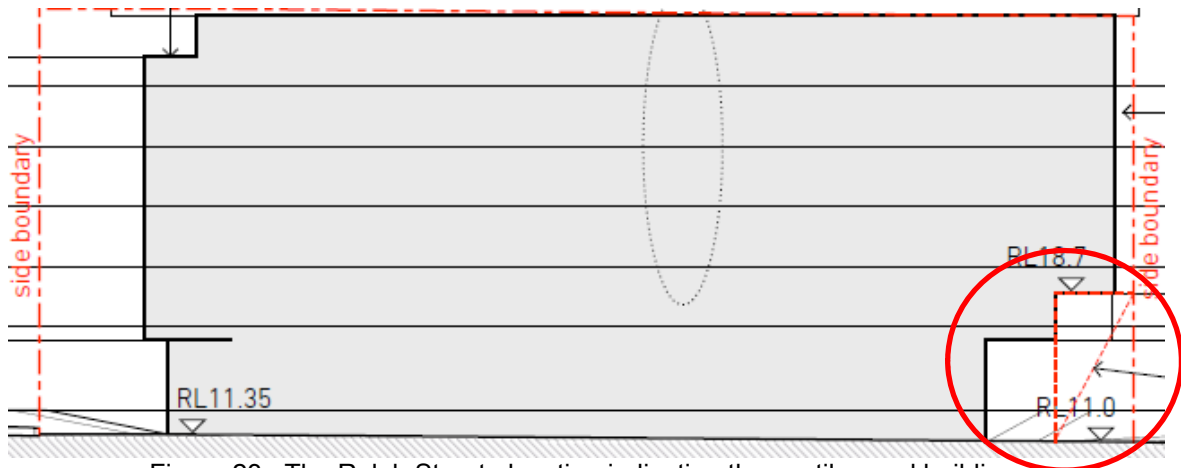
The Ralph Street elevation indicating the cantilevered building.
